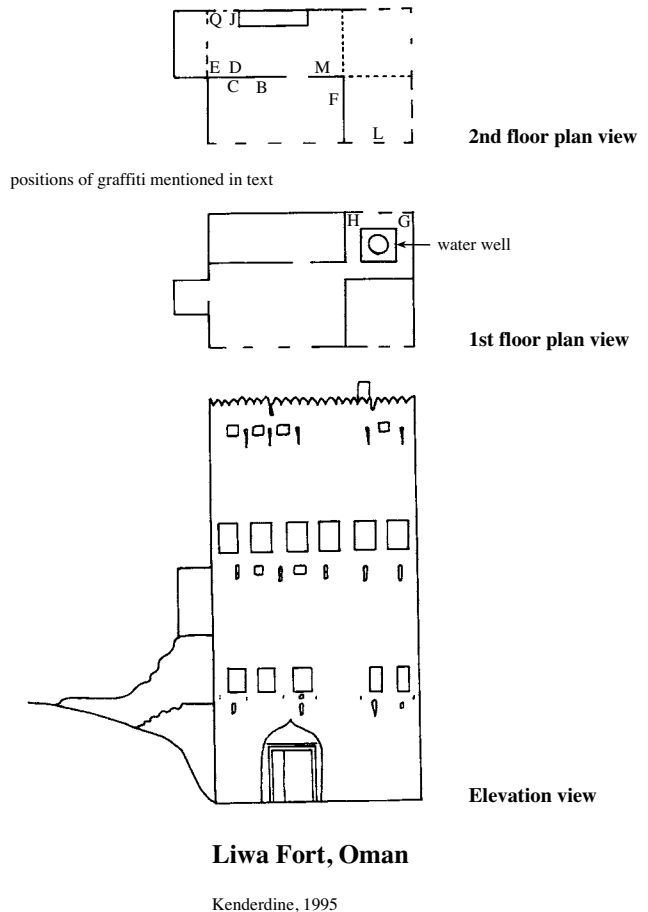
Plan and elevation views of Liwa fort (not to scale).
